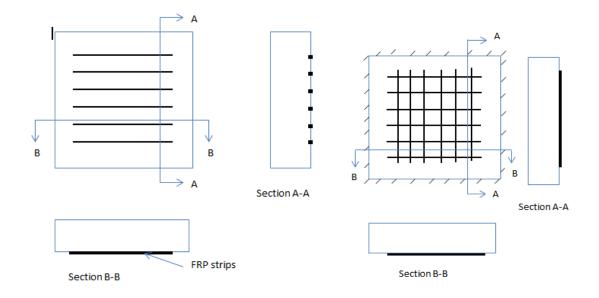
(a): FRP slab strengthening (1- way) (b) FRP slab strengthening (2-
